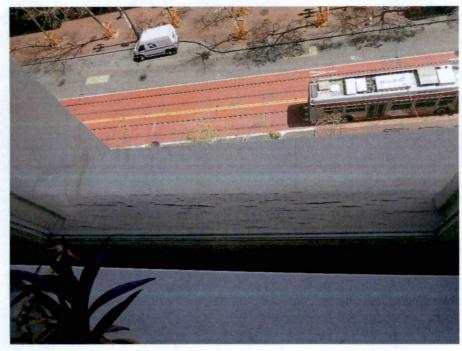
Photo AA: Detail view of deteriorating wood windowsill on sixth level along Market Street elevation, looking south.
